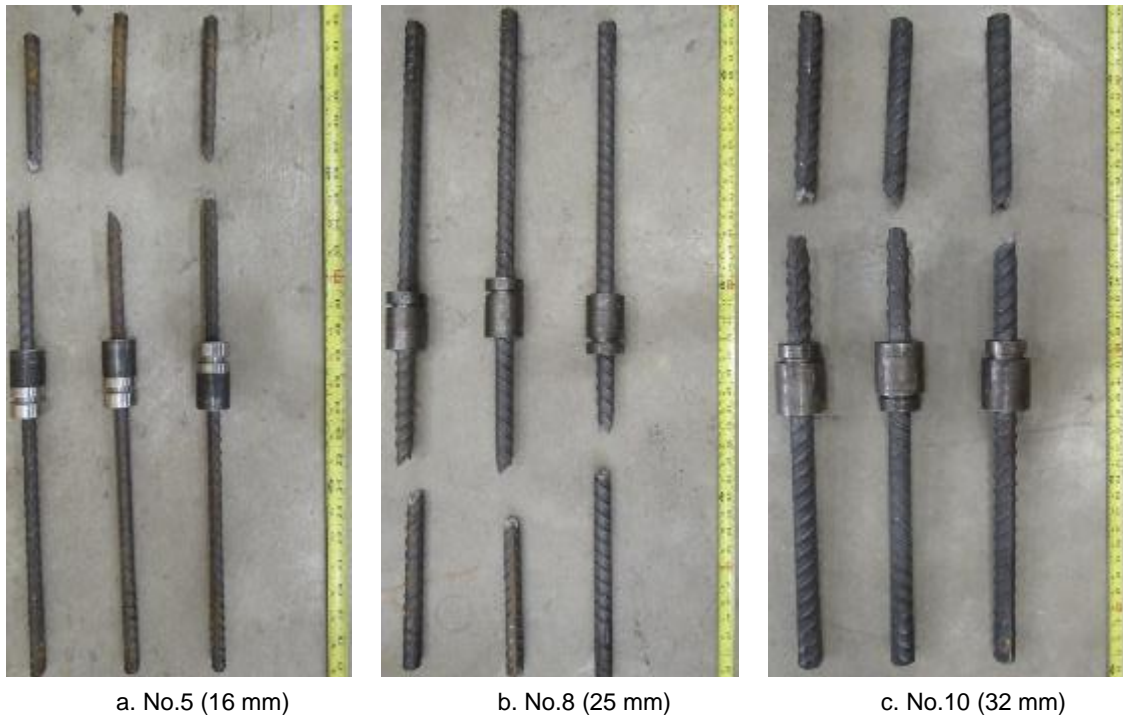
Failure of headed reinforcement couplers under cyclic loading
